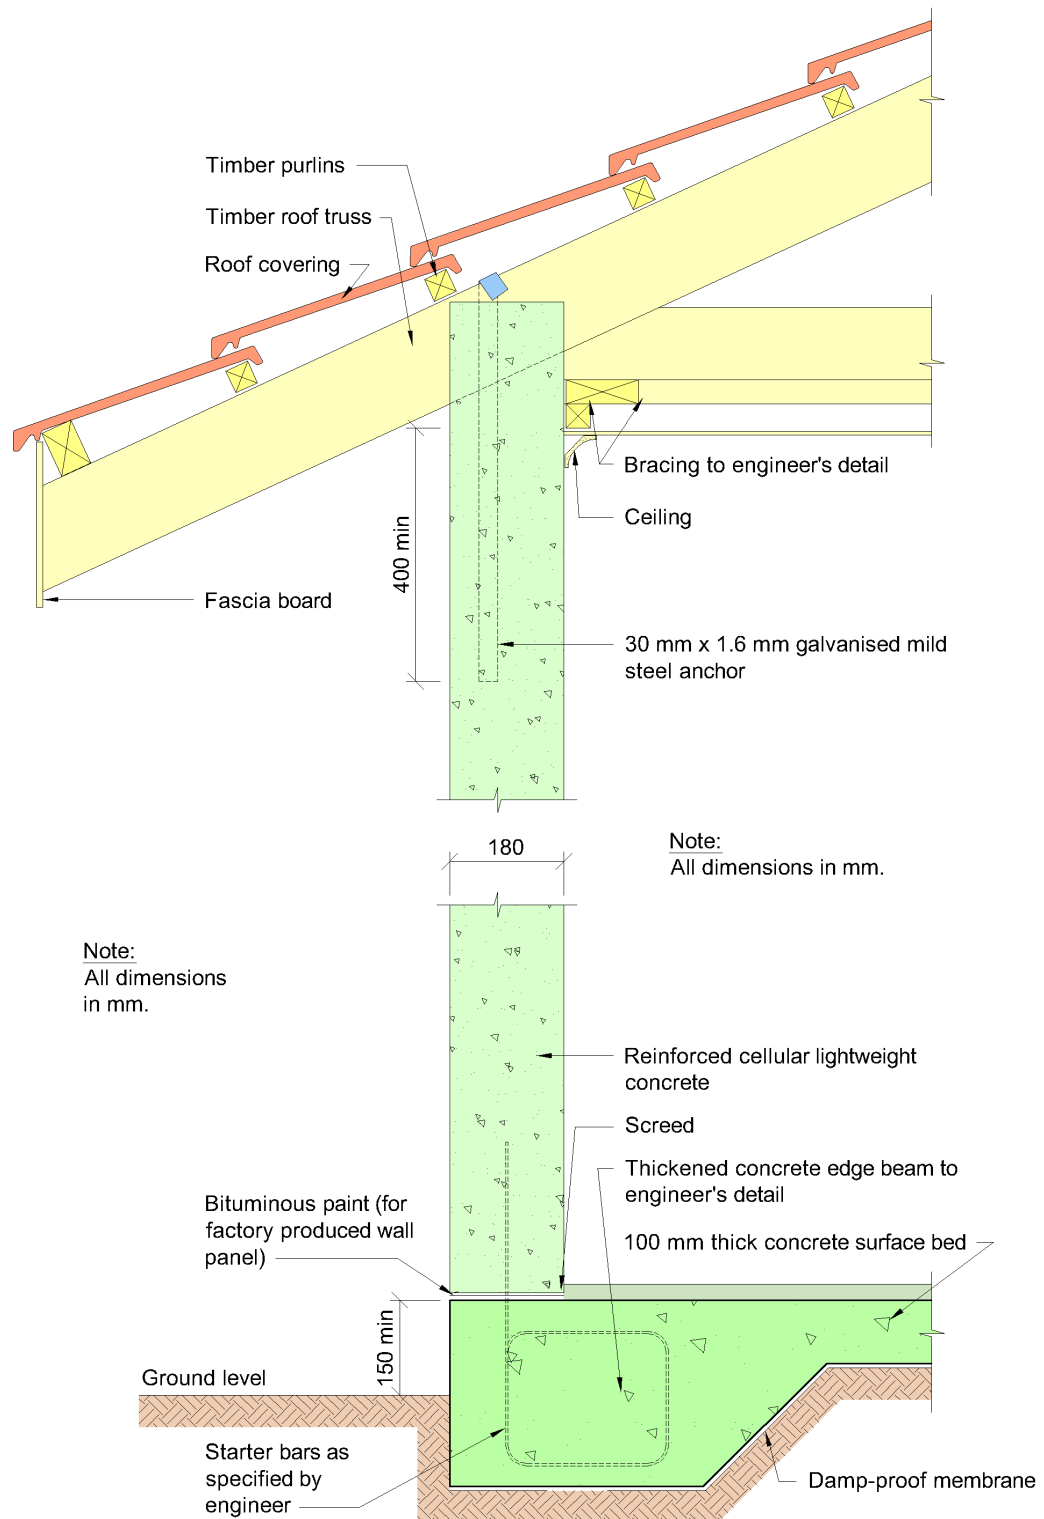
Vertical section through external wall showing foundation and roof anchorage details
